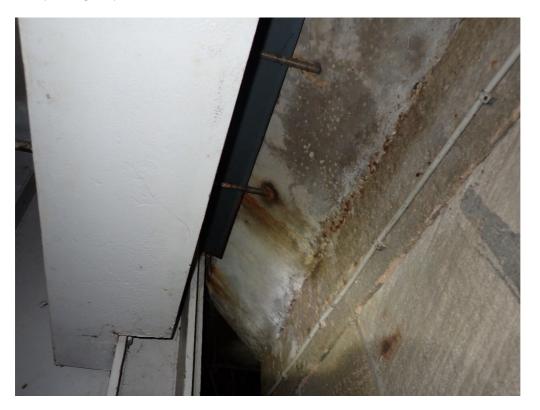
Rust staining emanating from the drainage deflector on the West Abutment, south end
